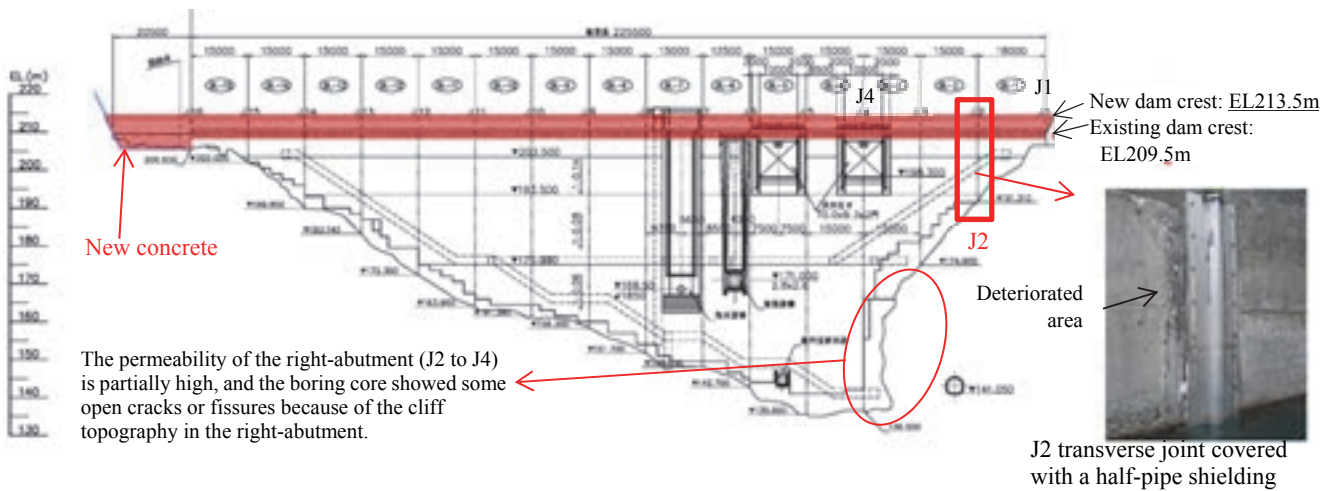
Upstream view of Kasabori dam (meshed zone shows the concrete placing zone)
